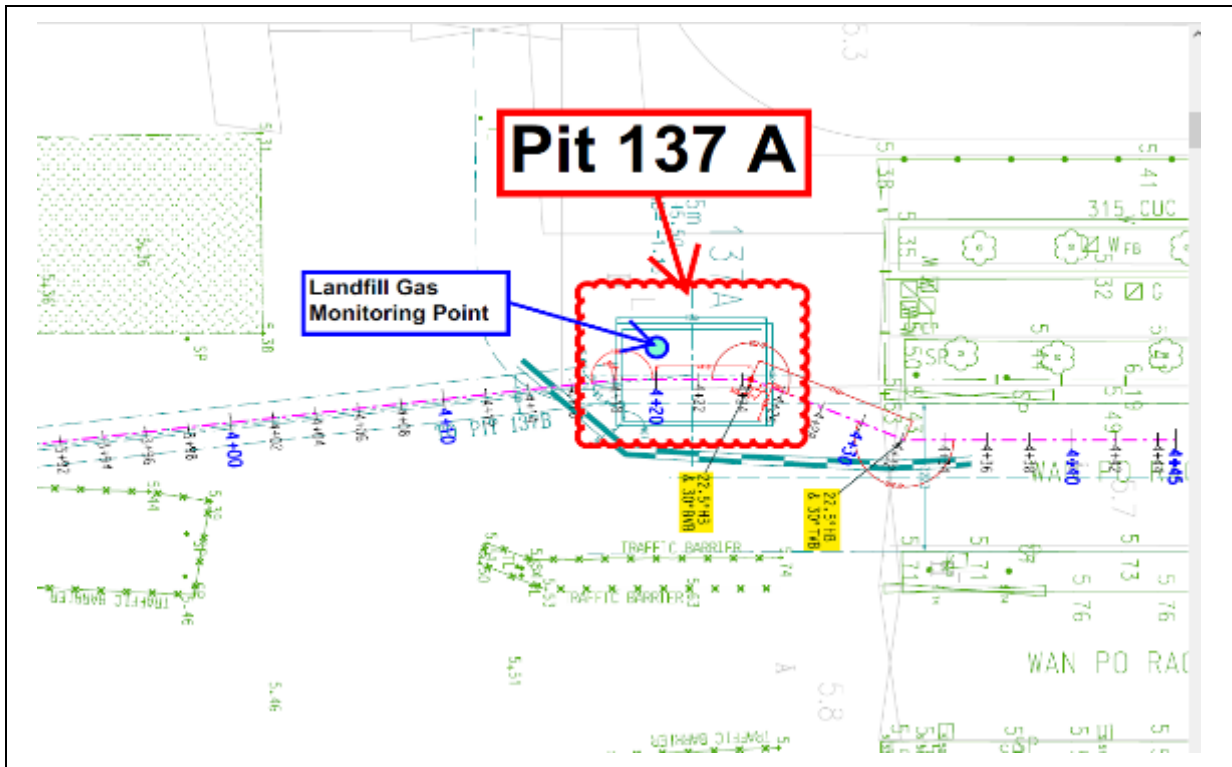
Monitoring Location – Pit 137A (137 Pit A)
